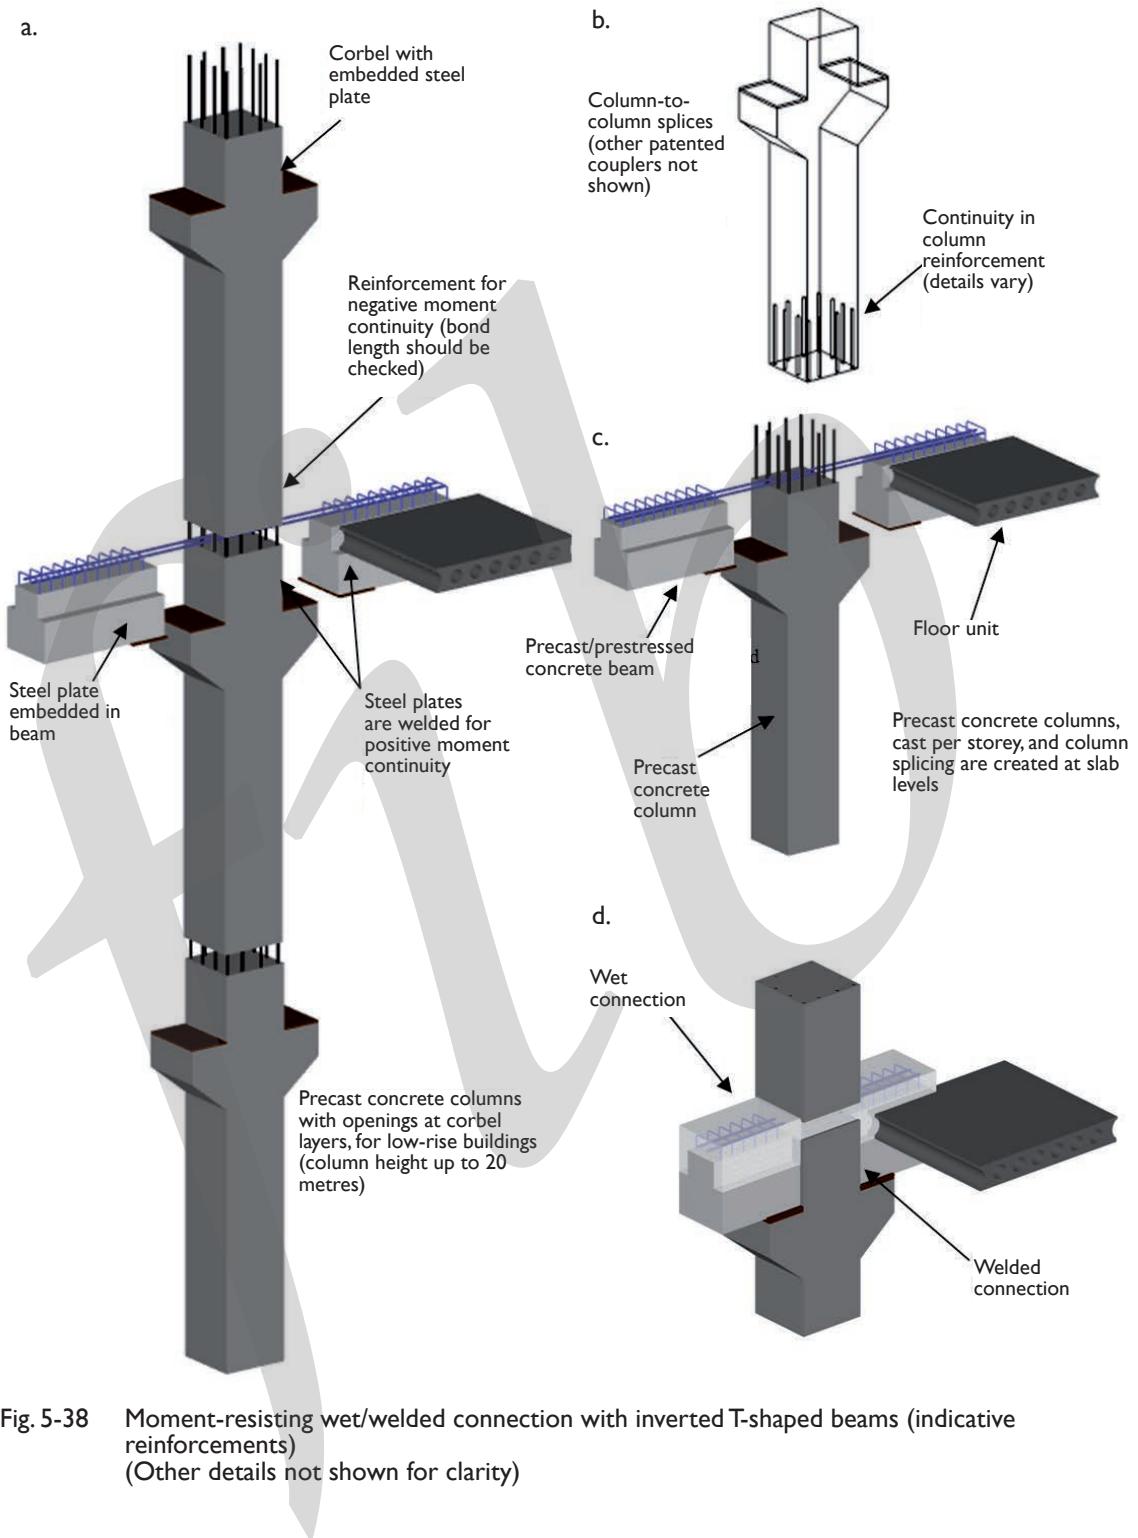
Moment-resisting wet/welded connection with inverted T-shaped beams (indicative reinforcements)
